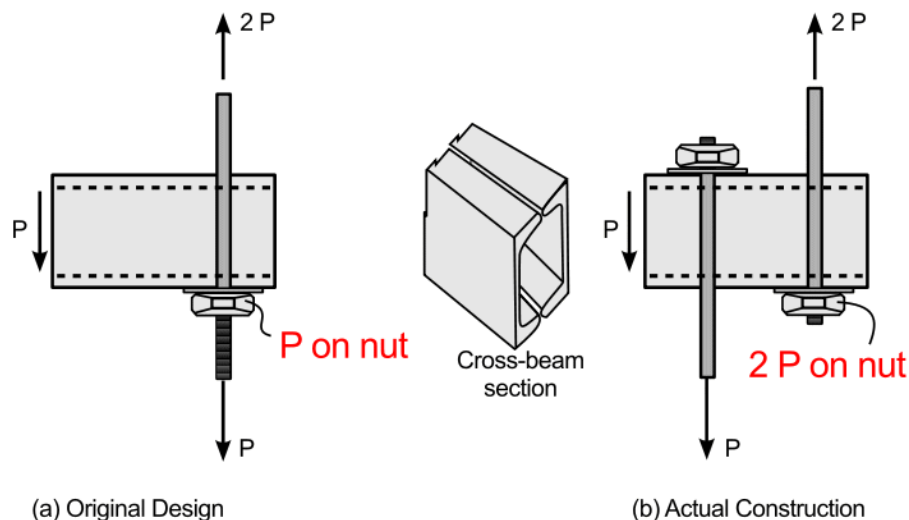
4th Floor Atrium Walkway Box Beam Connection Detail
